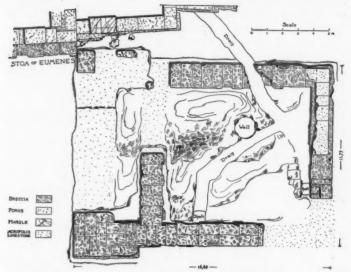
PLAN OF FOUNDATIONS, PRESENT STATE.
